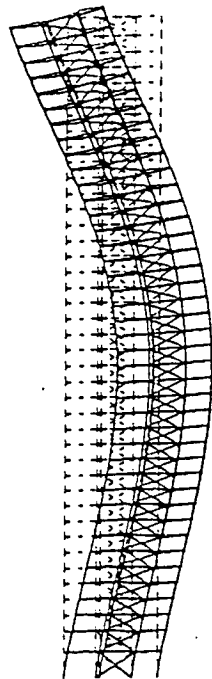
Retrofitted Steel Space Frame, Single Braced Bay
